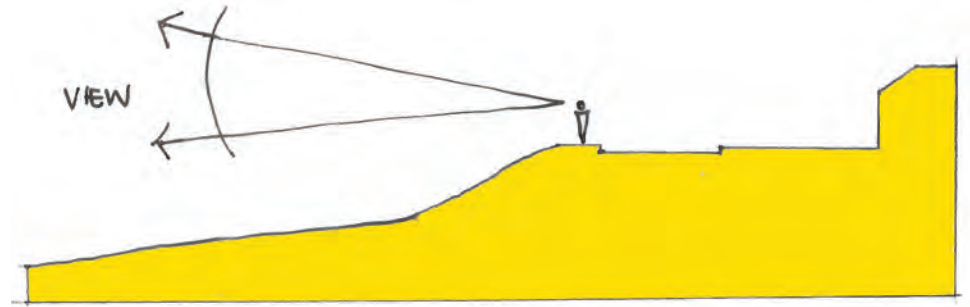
(ABOVE): The existing condition showing the relationship of the existing village houses to the street and the slope on site with views to mountains.
